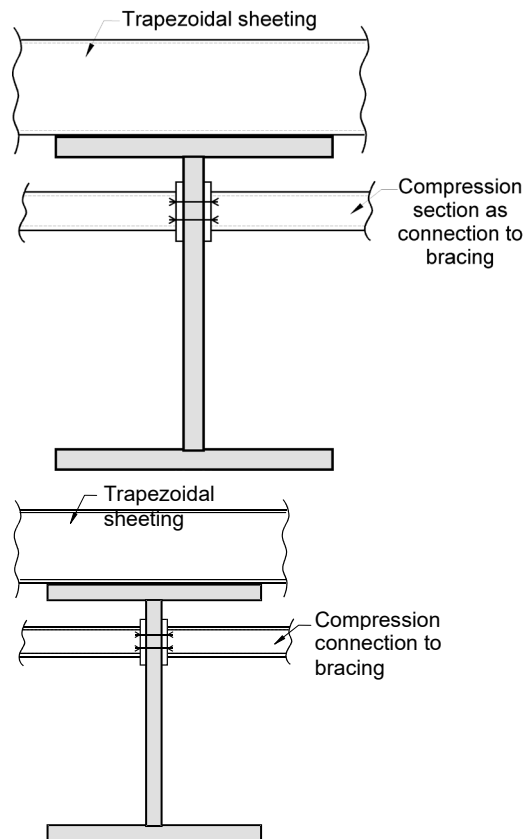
Stiffening by trapezoidal sheeting and compression sections
